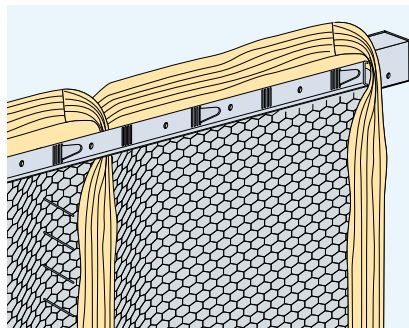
60mm Fire Barrier with overlap joints to obtain 60 mins integrity 30 mins insulation
